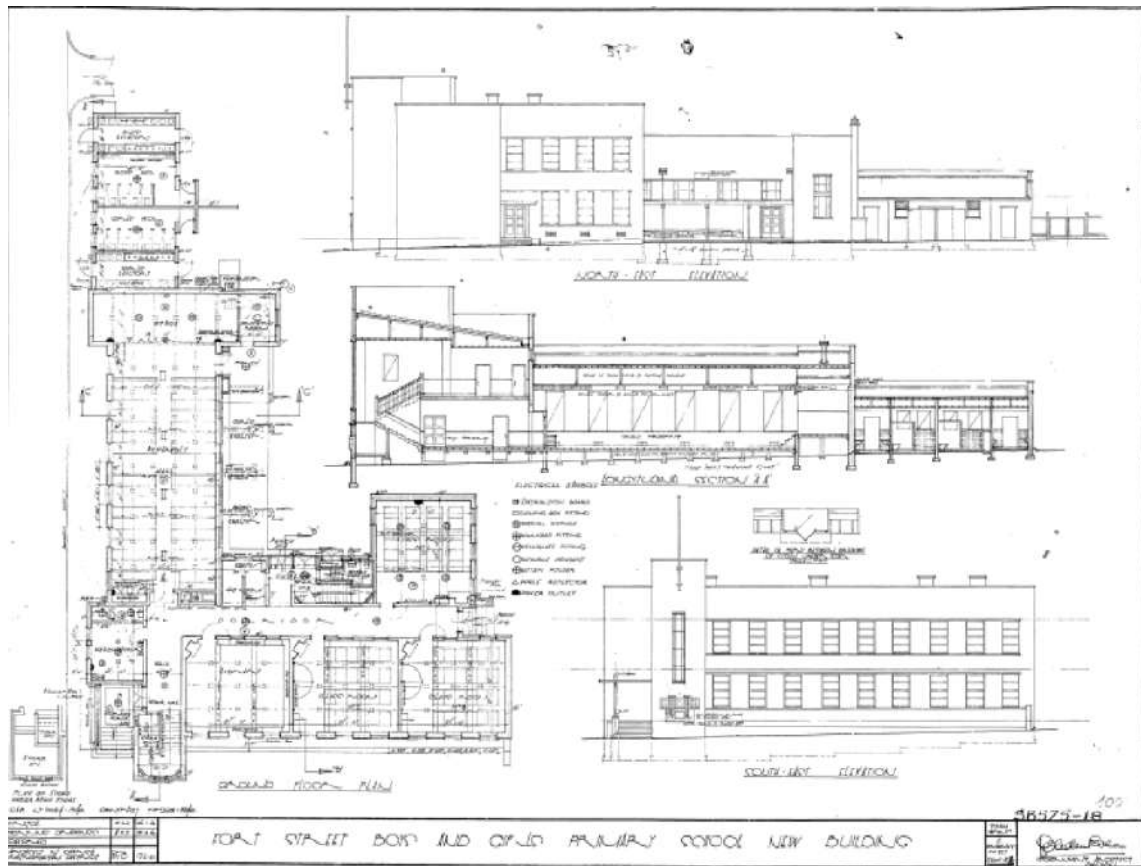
Drawing prepared in the Government Architect's office describing the ground floor plan, north east and south east elevations and a longitudinal section through the building. (Source: Finance & Services Information Services, drawing SB575-18.)
